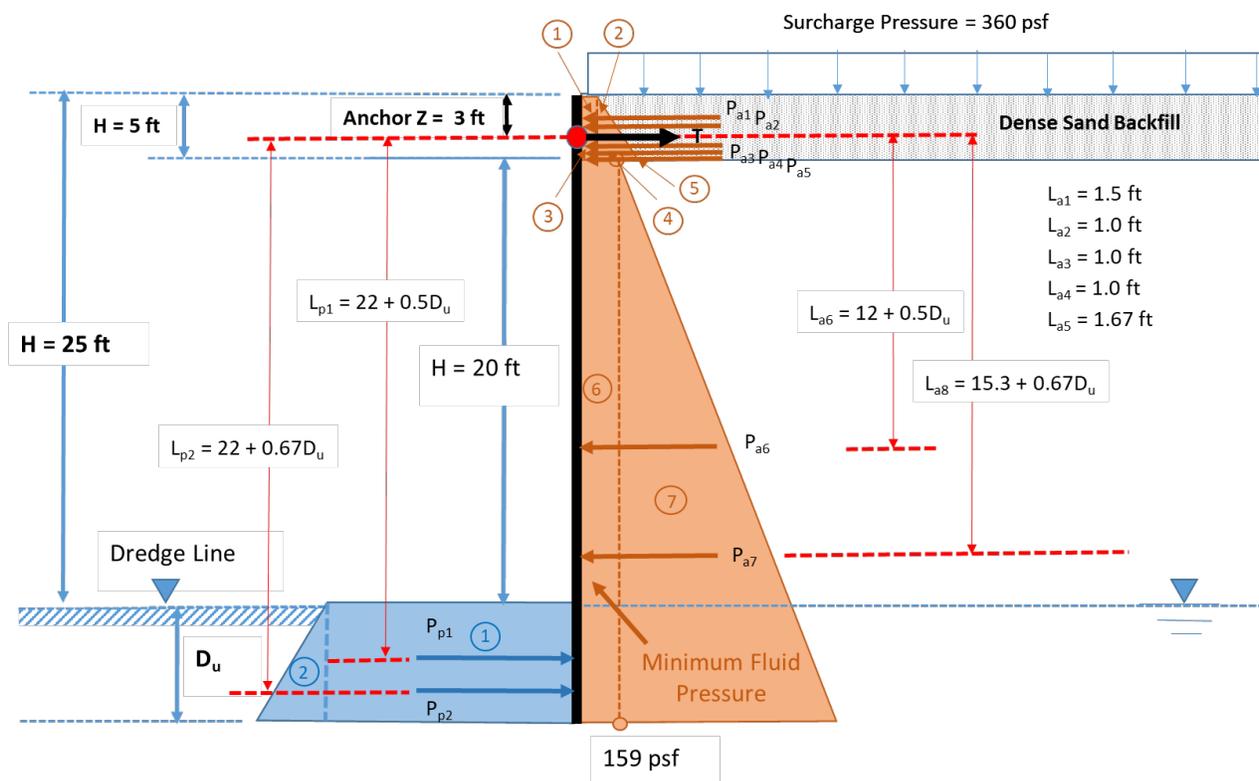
Case 5 Lateral active and passive forces acting on the wall.
